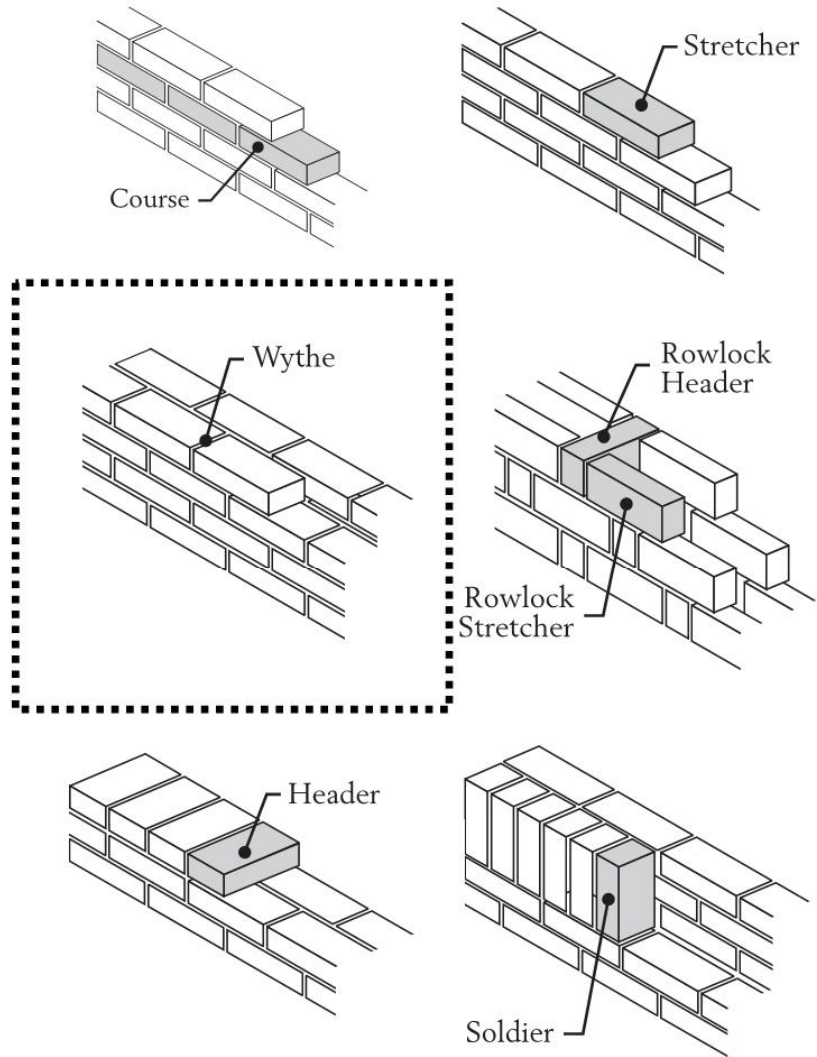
Example of a multi brick wythe solid masonry wall system
